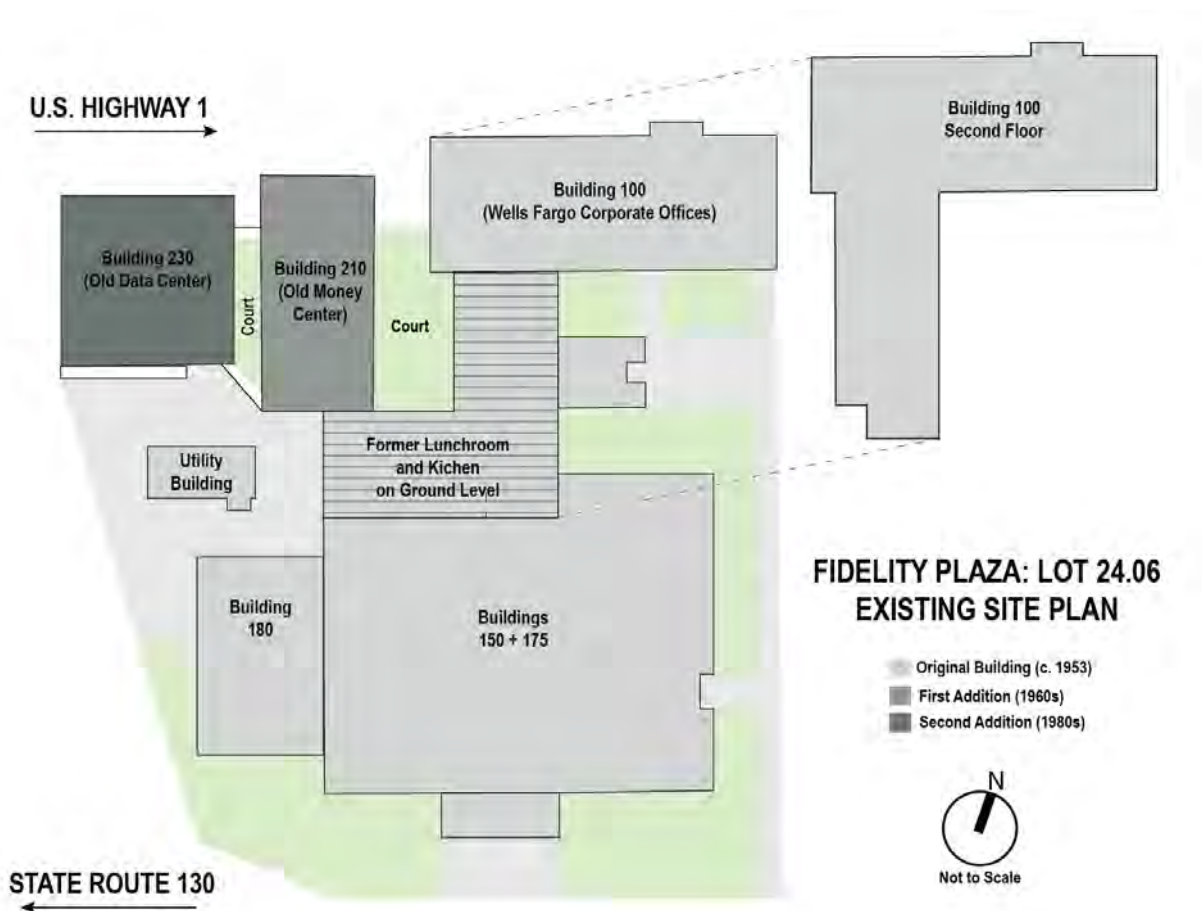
Site Plan of Existing Buildings on Lot 24.06.
